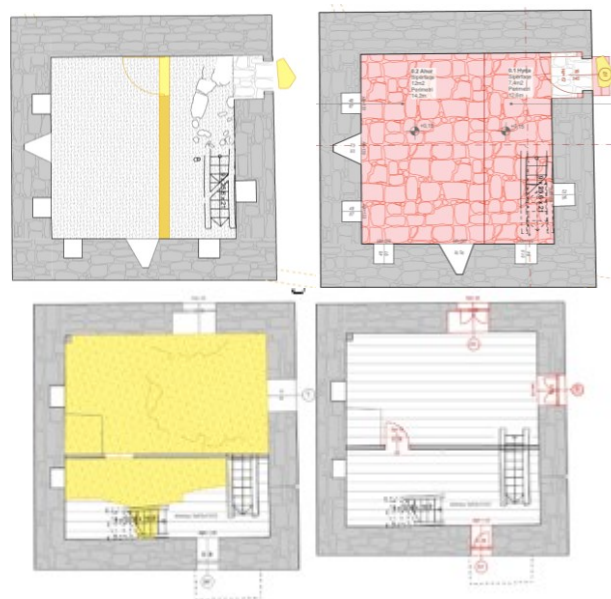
Restorations the ground floor with stone elements and floor restoration (right photos)
